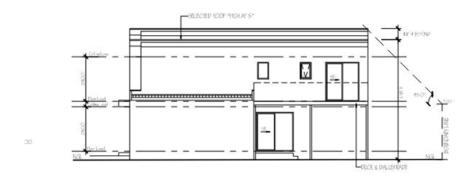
Eastern elevation for Units 2 to 5 (G Hills & Partners Architects, 2020)
